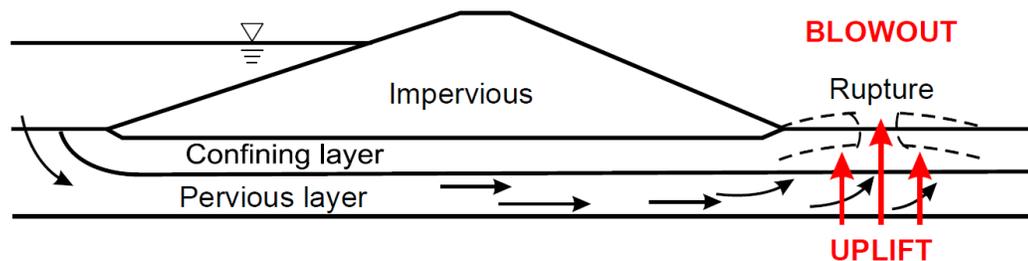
Uplift and/or Blowout at the Toe of an Embankment (Pabst et al. 2012)
